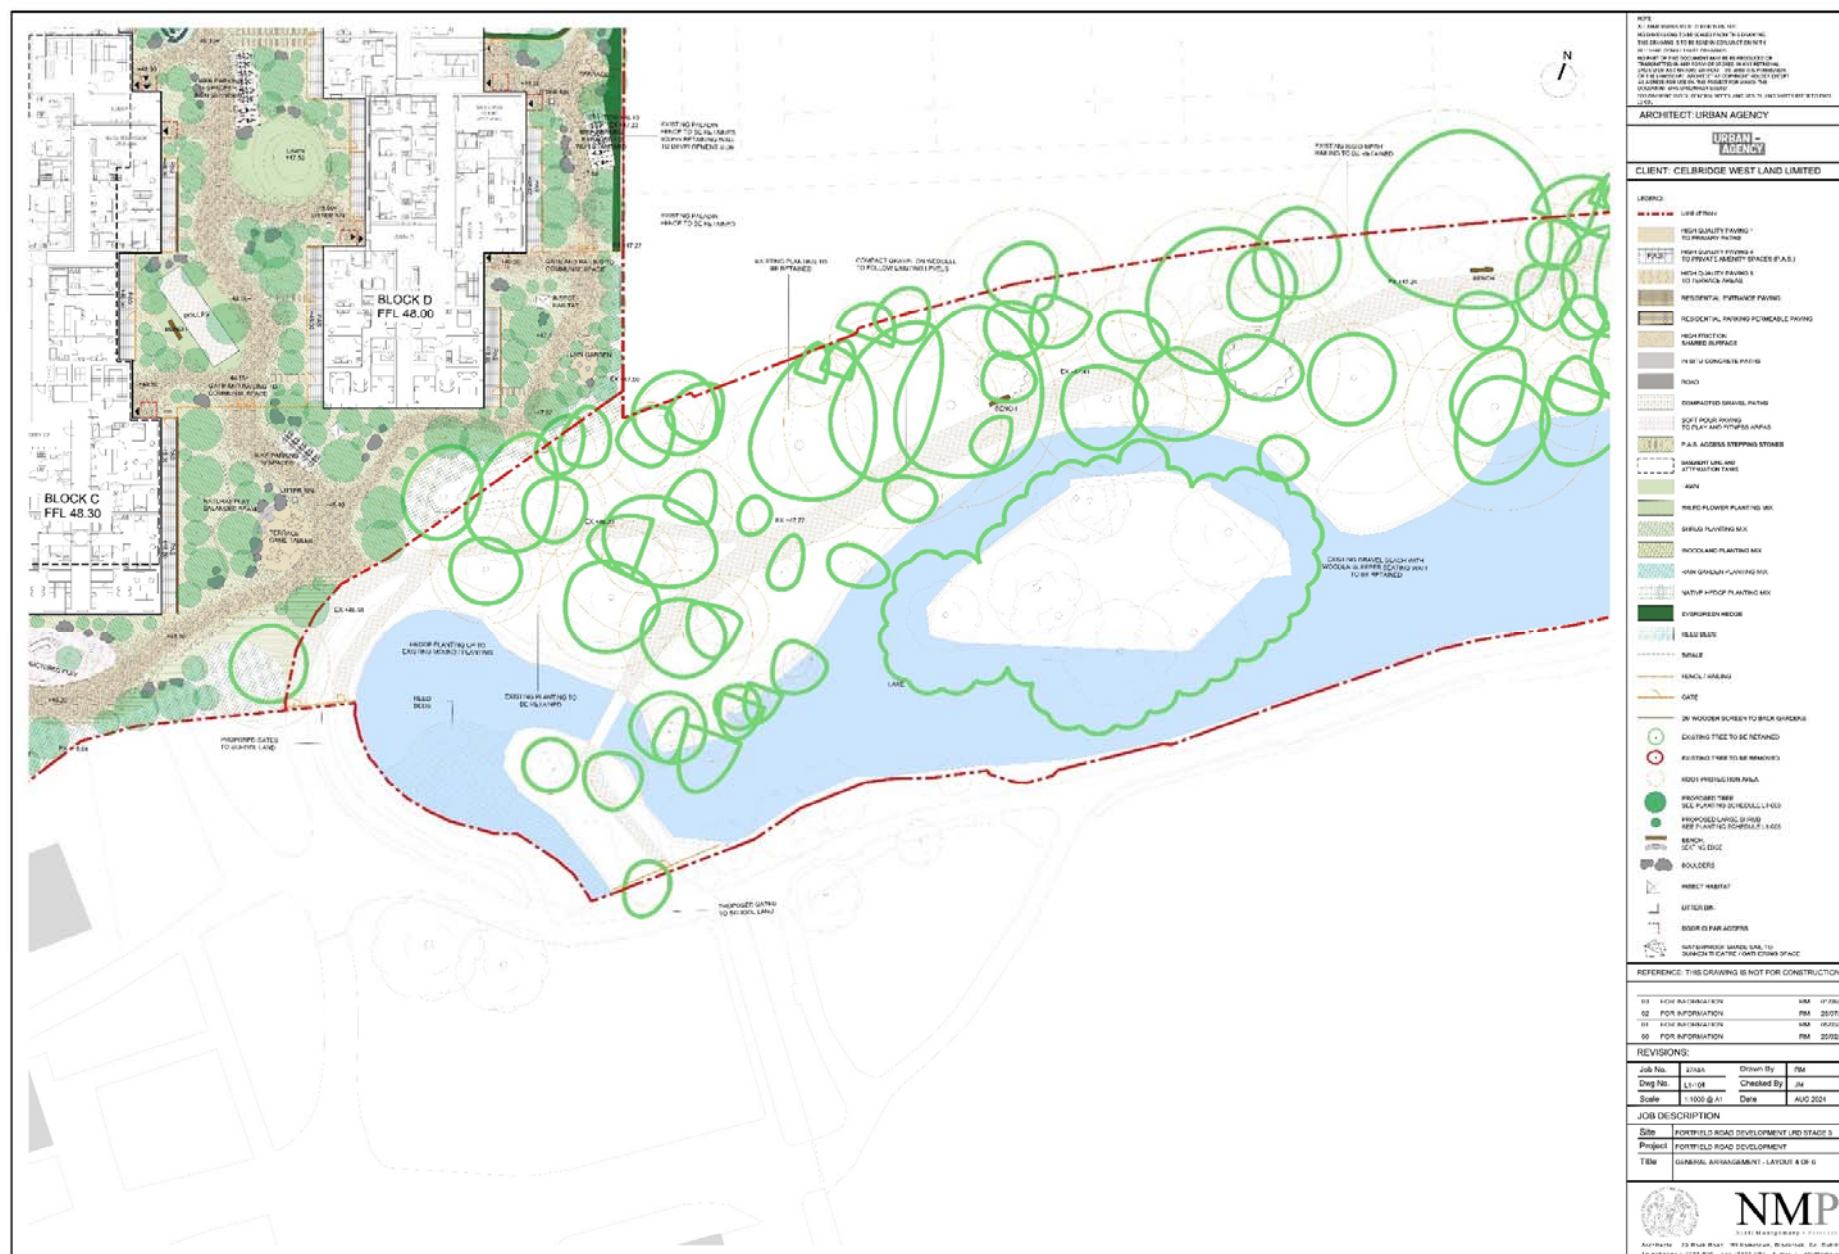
Landscape General Arrangements Plan (Sheet 4 of 6)
